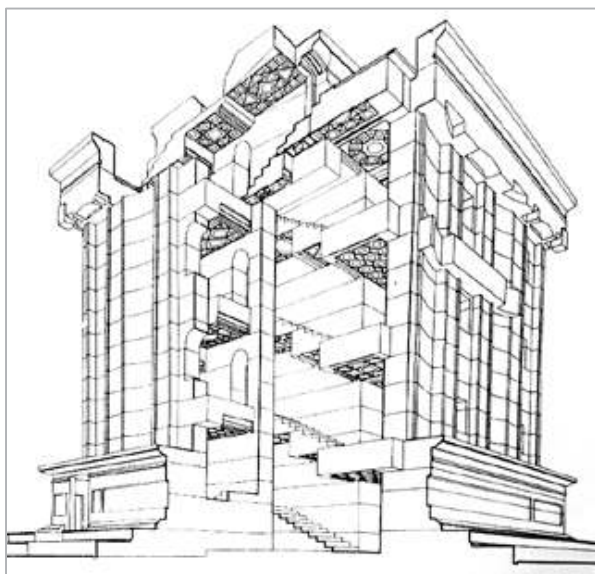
The Altar Tower / Great Observatory tower in Baalbek. Reconstruction (Collart and Coupel 1951, Table LXII).
